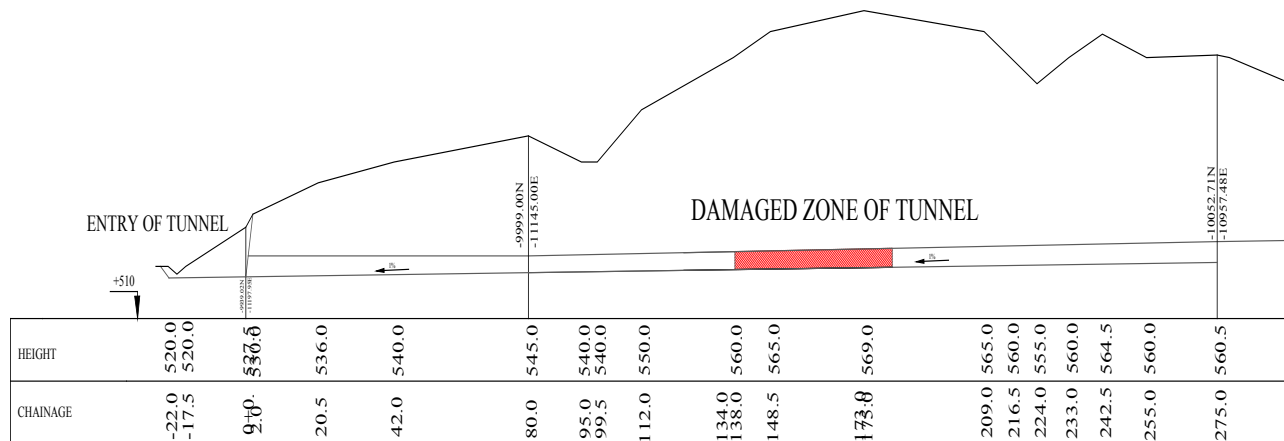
Longitudinal section of the St.Dimitrios –Arachova drainage tunnel
